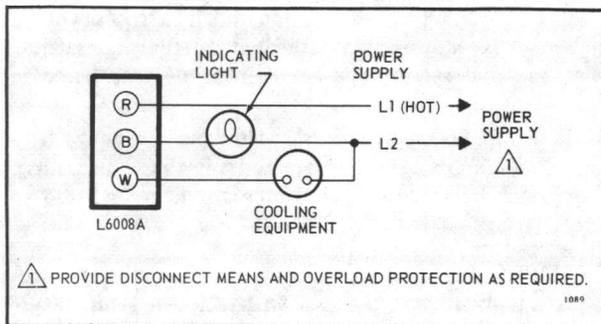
L6008A USED TO CONTROL COOLING EQUIPMENT AND INDICATING LIGHT.
